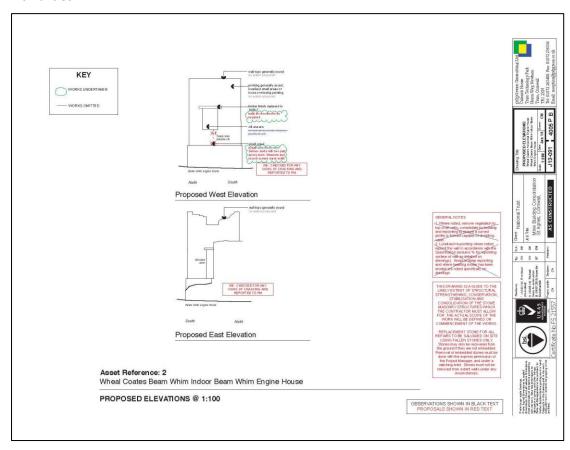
Eastern and western external elevations of Wheal Coates horizontal engine house.
